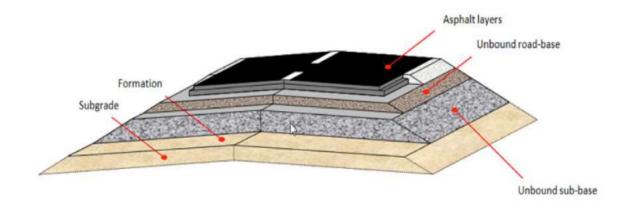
ASPHALT LAYERS FOR SURFACE PAVEMENT [37].
